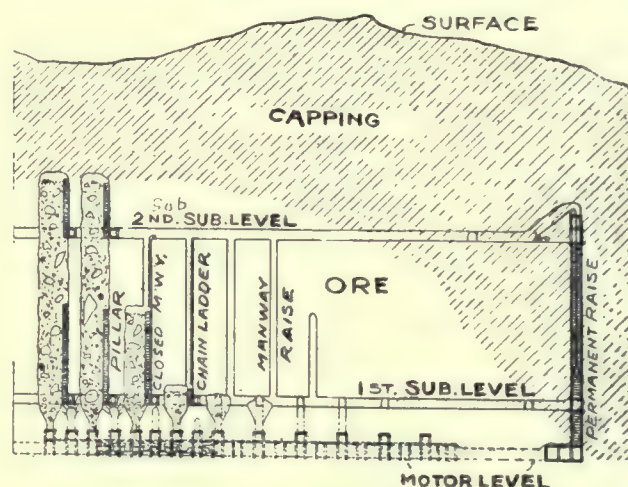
CROSS-SECTION, SHRINKAGE STOPES AND PILLARS.
